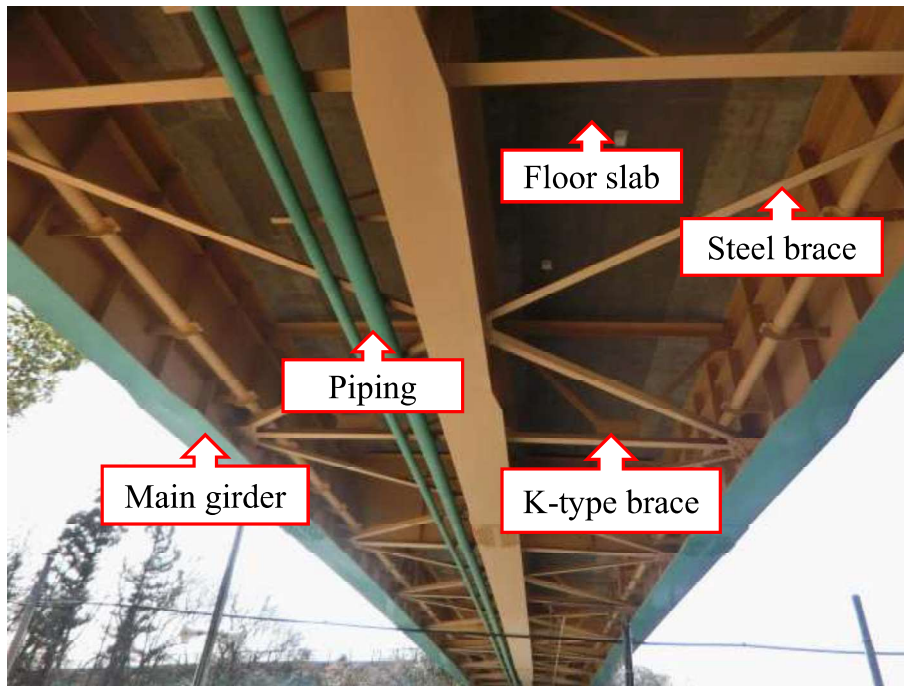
Steel girder bridge with a large number of steel bracing including k-type bracing in the crossbeam.
